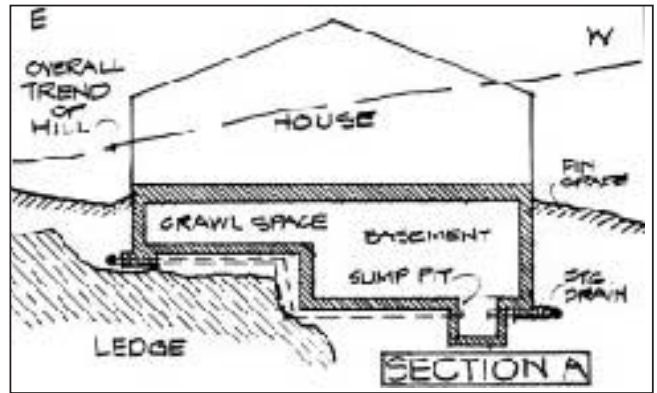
The hill we are building on is noted for its ledge and its springs. Even though groundwater was 5 feet below the basement, the owners wanted a sump pump installed.
